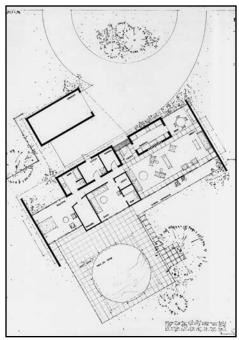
Jaffe-Garrett House plan (built 1959) [Charles Reed, Jr. collection]
